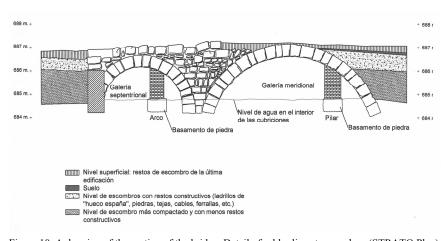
A drawing of the section of the bridge. Detail of ashlar limestone arches. (STRATO Plan)
